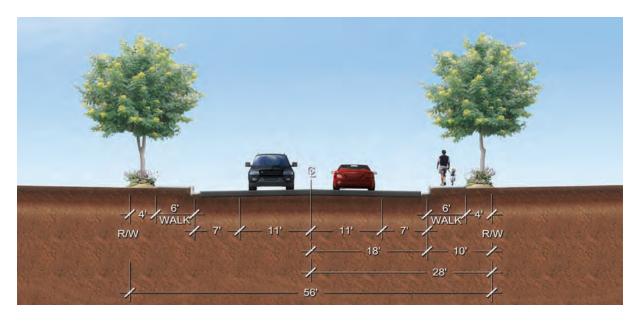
| Existing Road(s) Section (56' R.O.W.)
